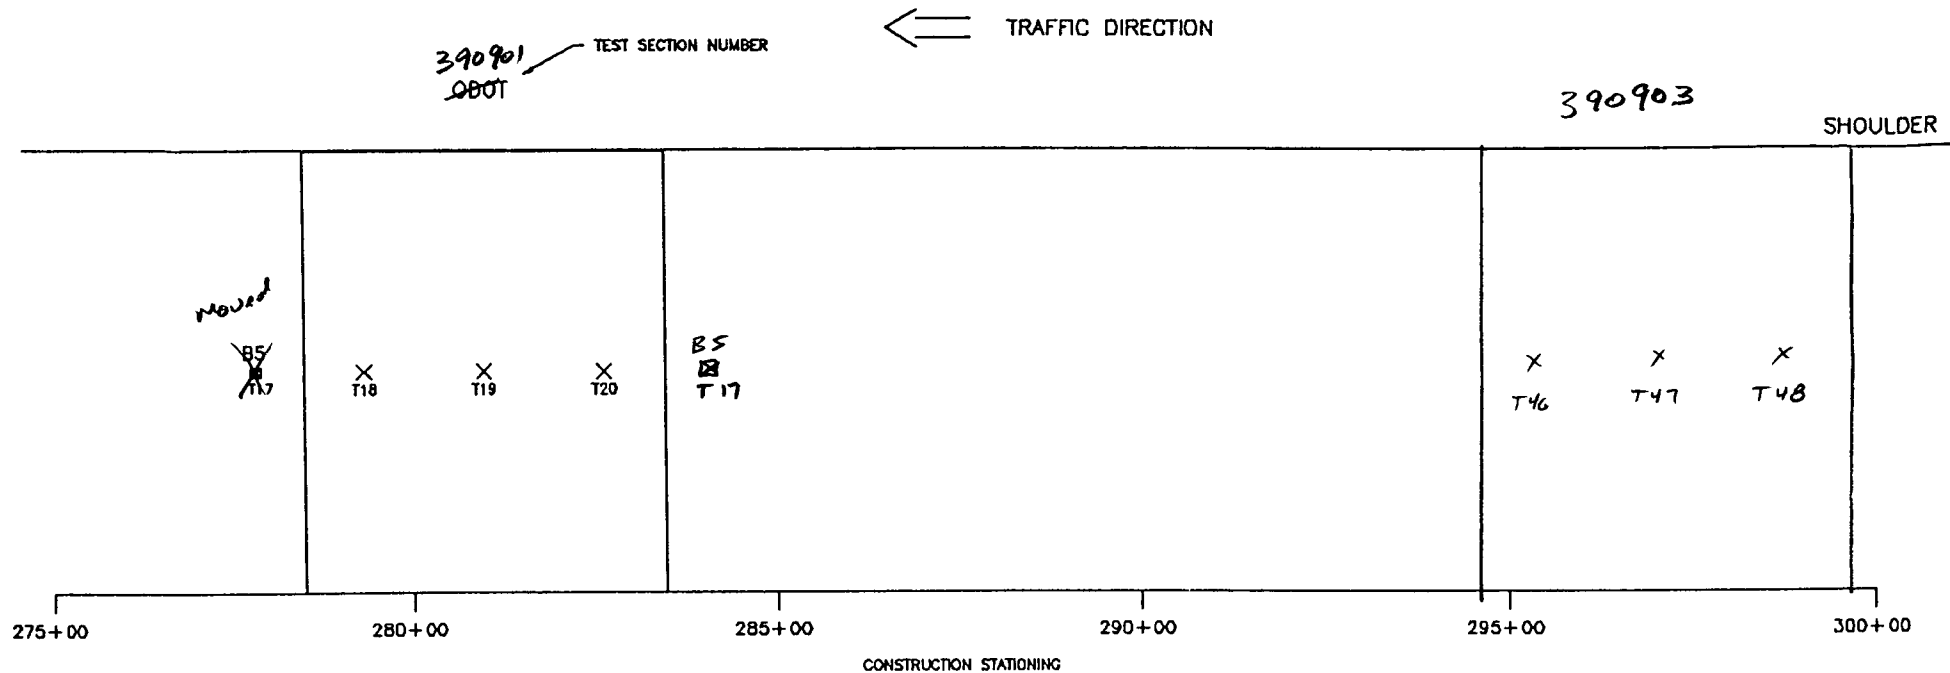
OVERVIEW OF SAMPLING AND FIELD TESTING PLAN FOR EMBANKMENT - SPS9
